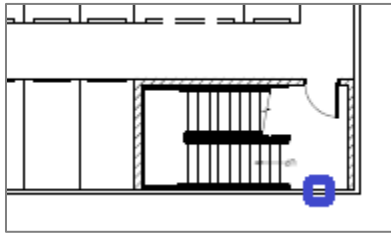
example floor plan stairwell approximate window location marked in blue
